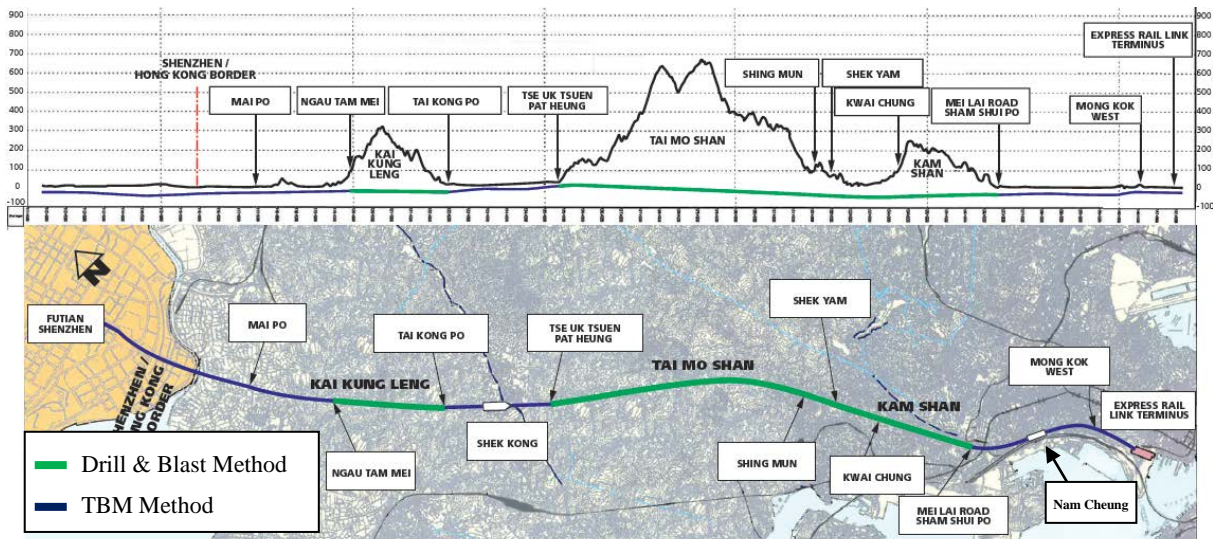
Tunnel Section constructed by Drill & Blast or TBM
